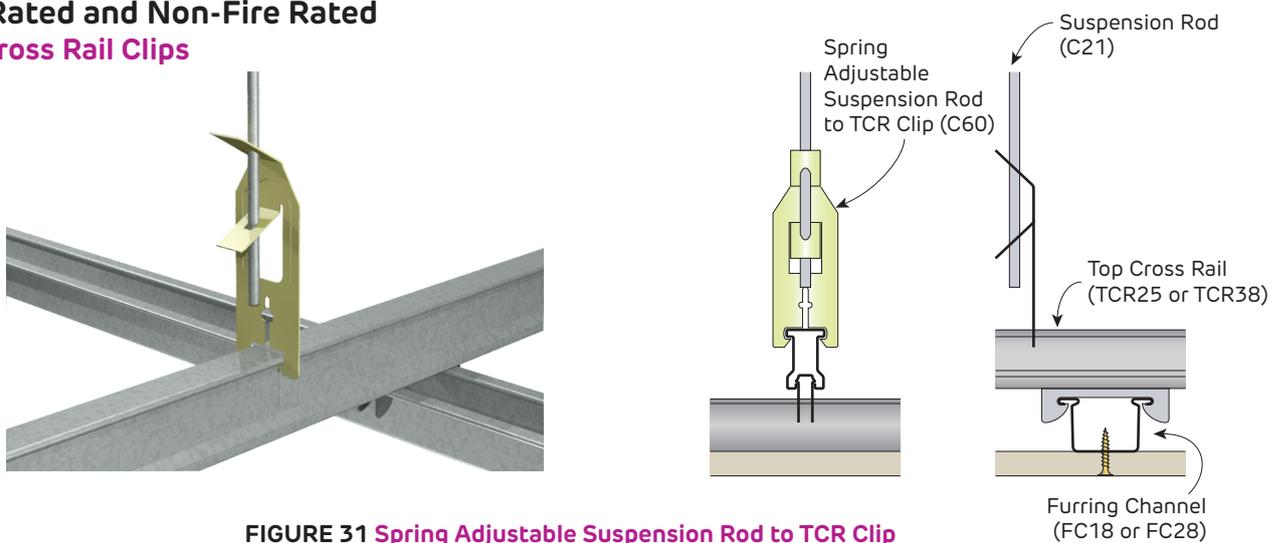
Spring Adjustable Suspension Rod to TCR Clip
